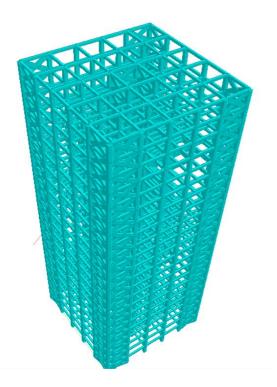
(b): 3-D View of structure with equivalent shear wall
